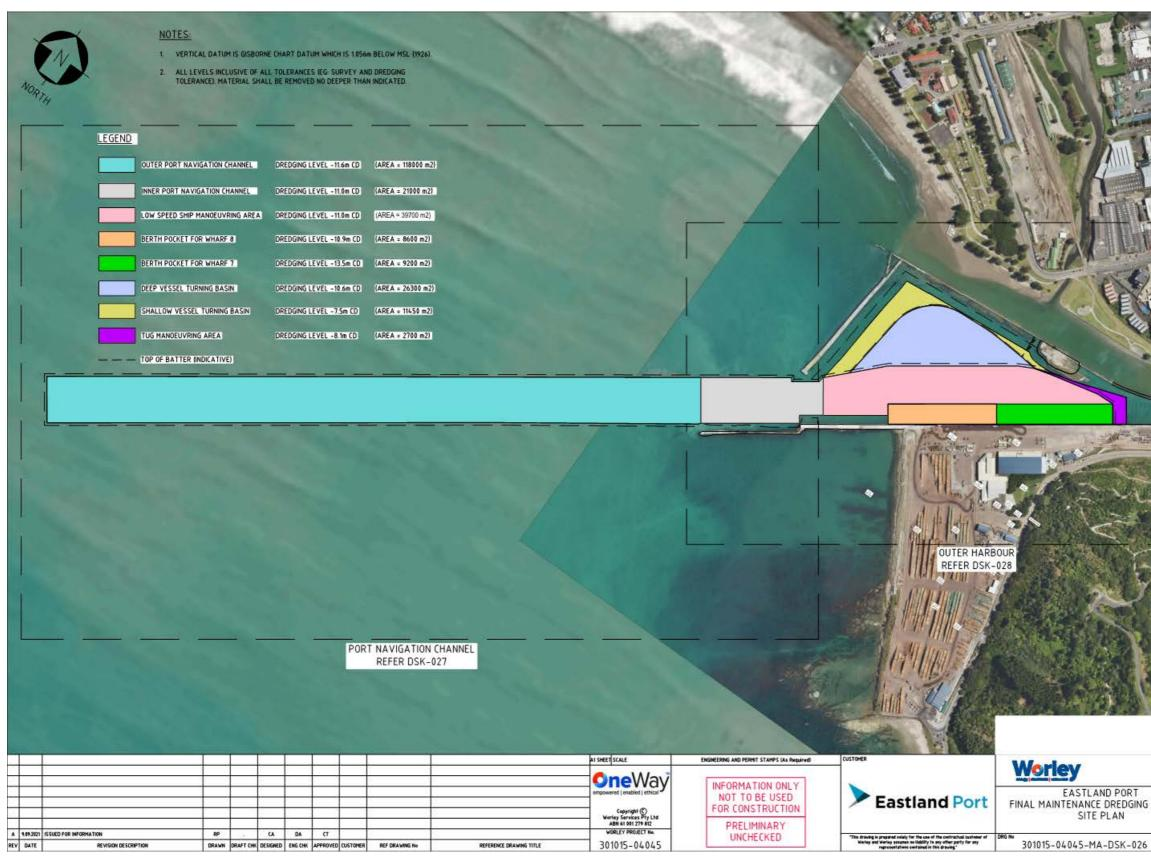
Proposed Maintenance Dredge Levels – Site Layout
